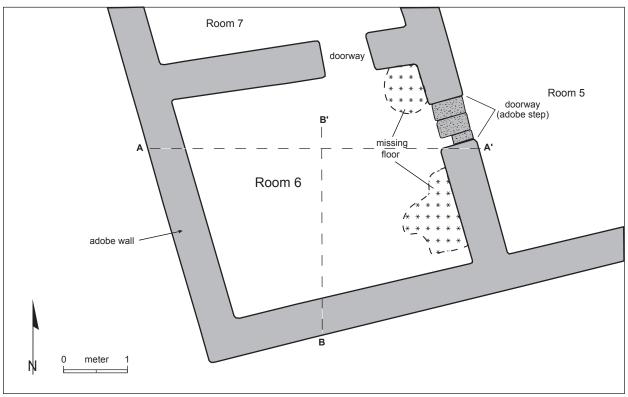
Plan of Room 6, Structure 1 at the Trujillo House.
